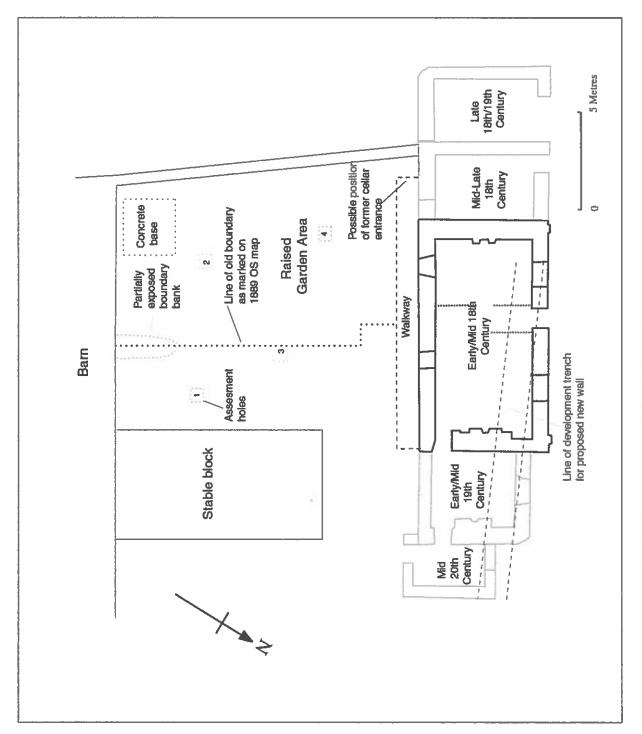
Ground Plan of Gelli-Gron & garden area Showing location of proposed development trench for proposed new wall, assessment holes, line of late 18th - mid 19th wall and phasing
